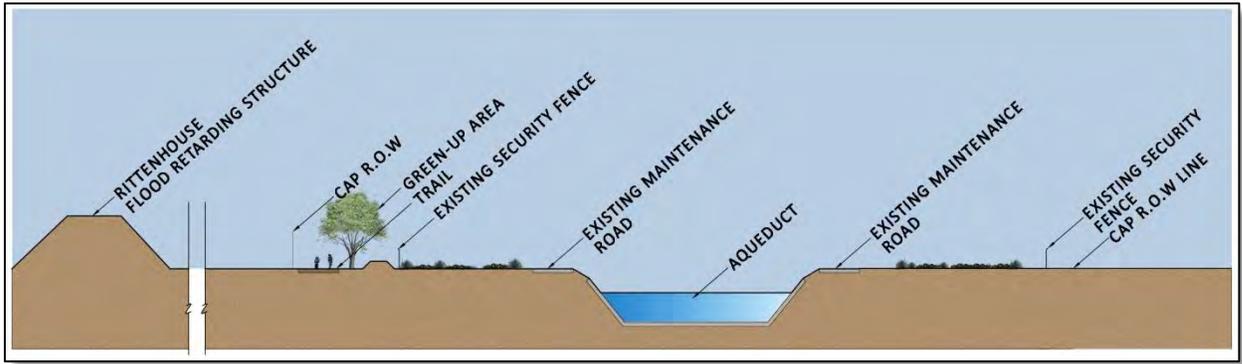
D: Cross-Section STV-1 - Typical of Mile Post 0.0 to Mile Post 2.1
